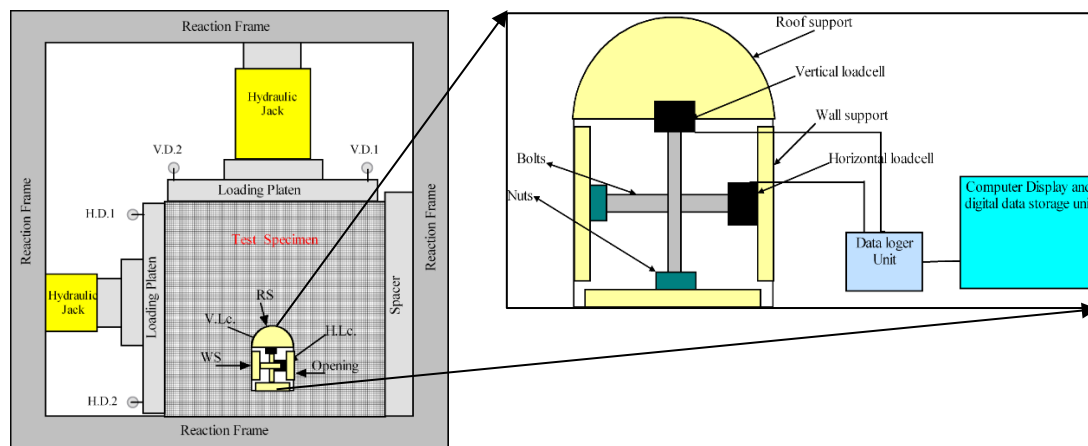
Test setup highlights the arrangement of hydraulic jacks, dial gauges, load gauges and loading platens within a reaction frame.
